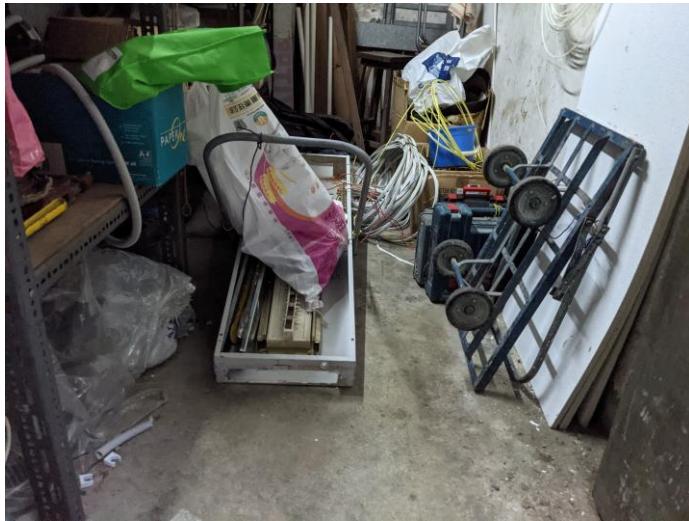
Existing store room (previous as boiler room near workshop C) at G/F
